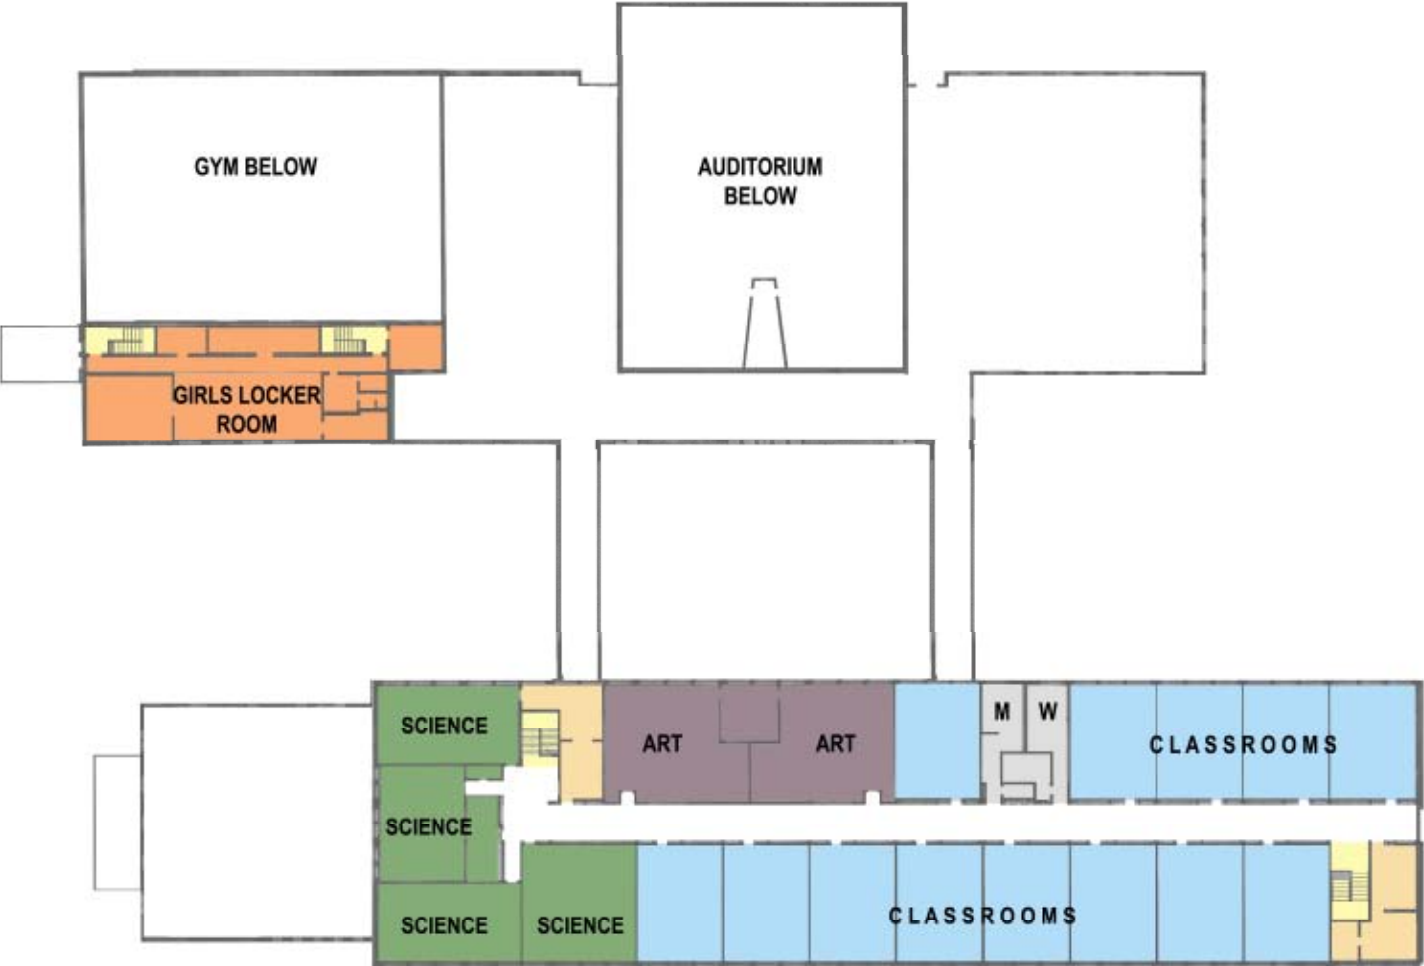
WASHINGTON MIDDLE SCHOOL SECOND FLOOR PLAN
